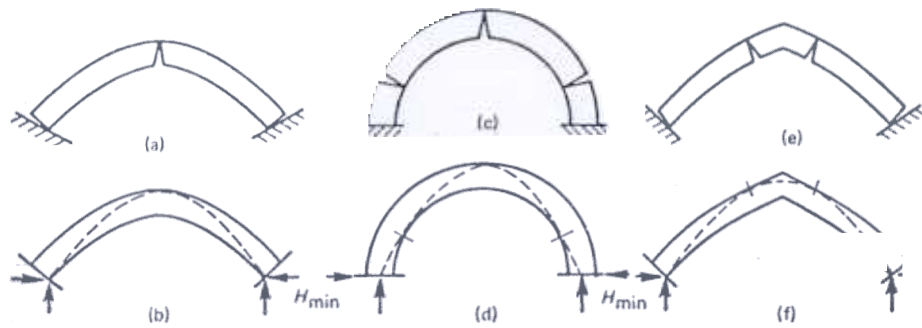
Crack patterns in masonry arches resulting from increased spans.
